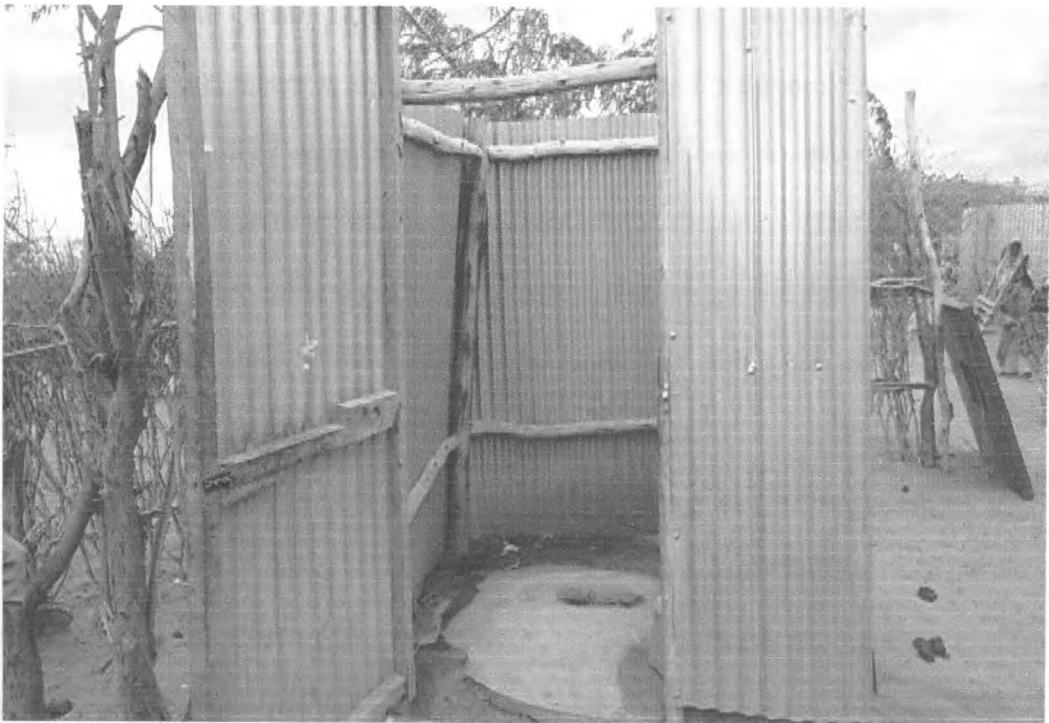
Toilet facility at the Daadab Refugee Camp
